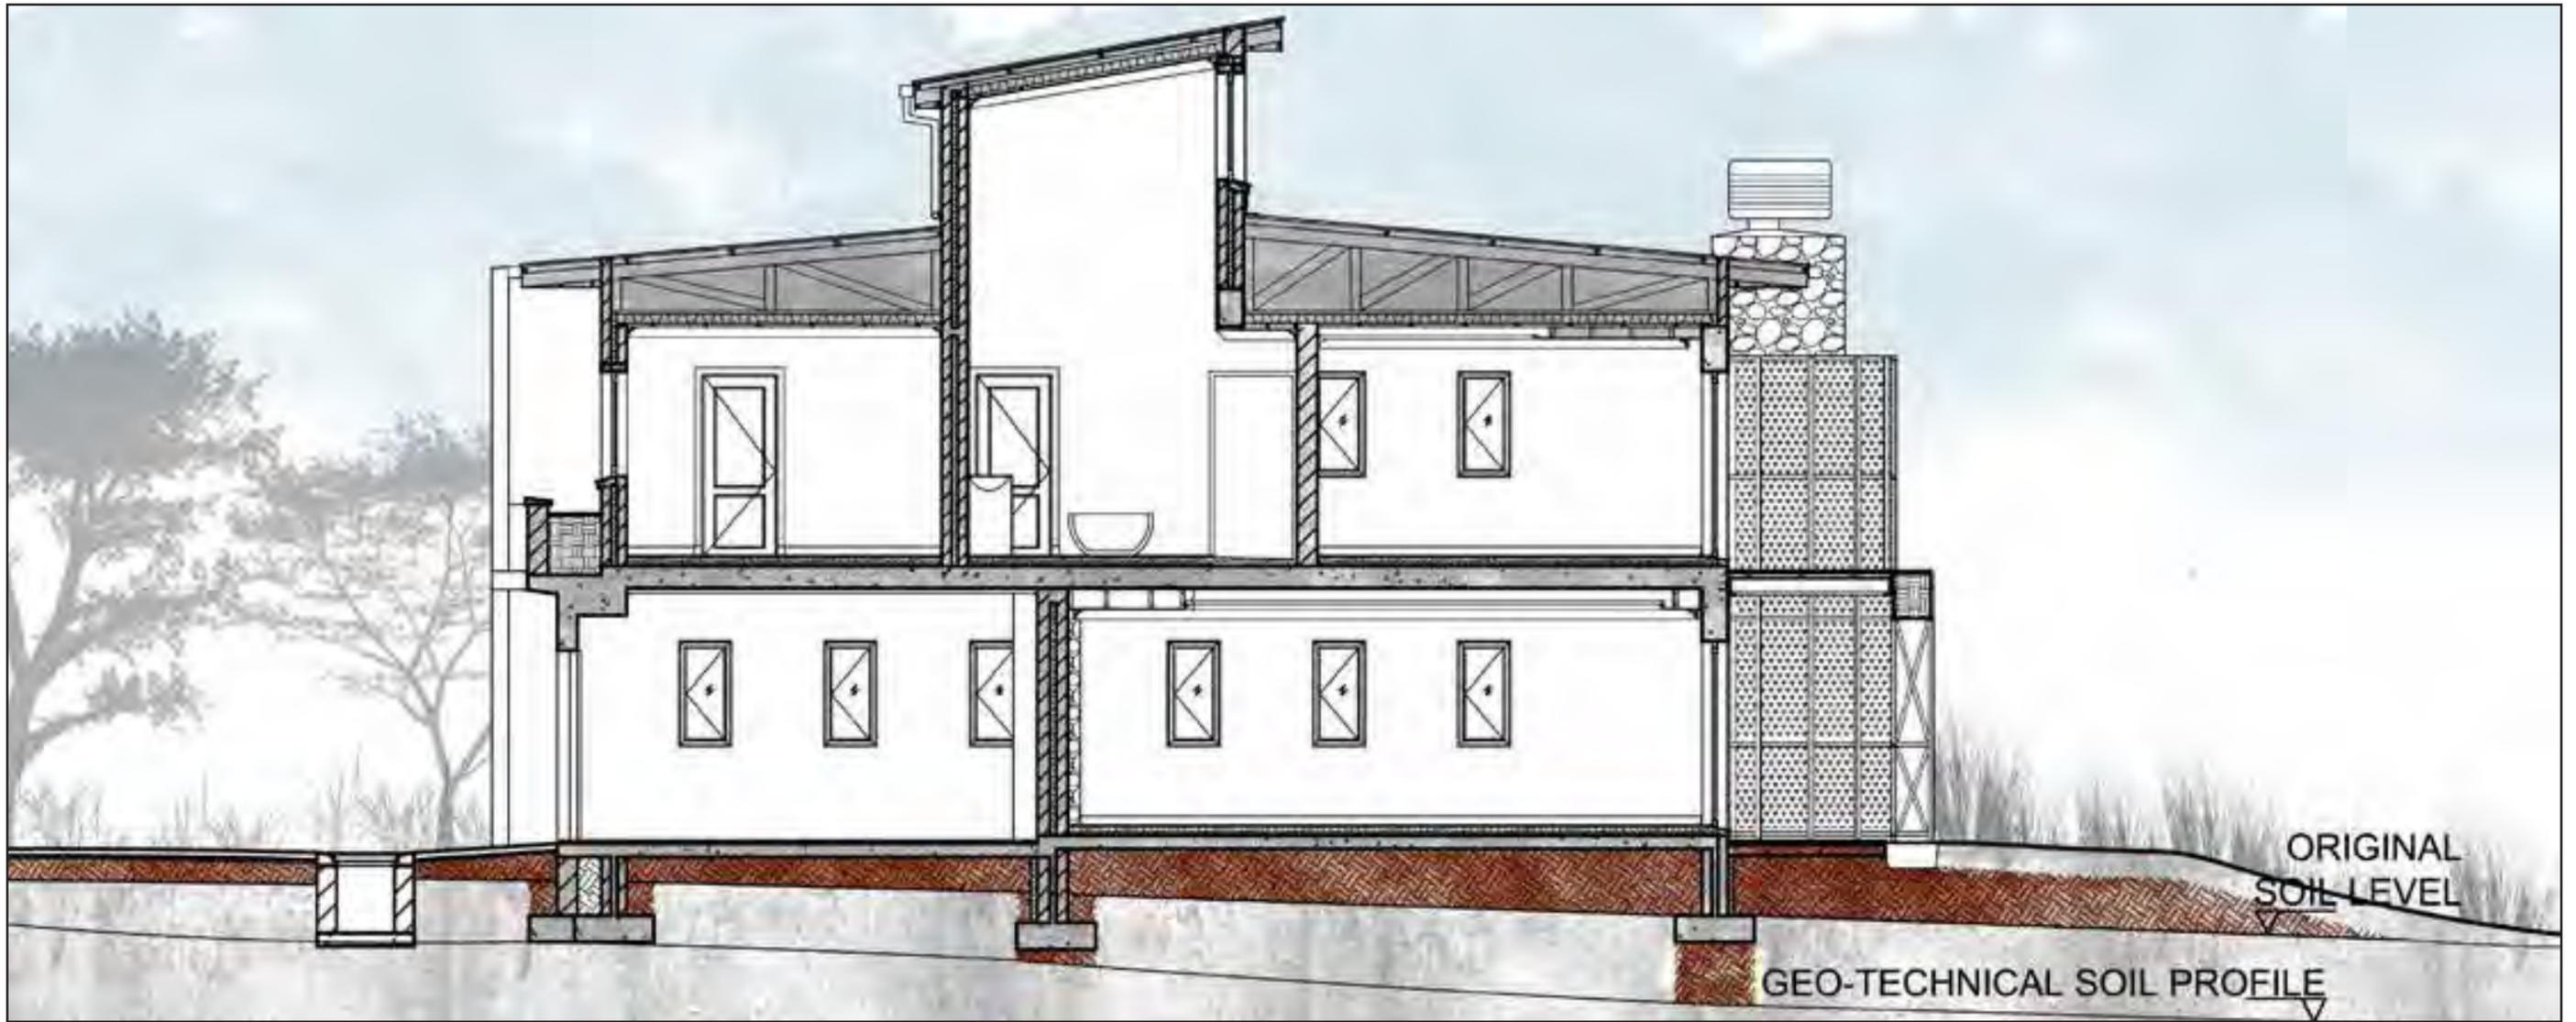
SECTION A-A INDICATING GEO-TECHNICAL SOIL PROFILE
